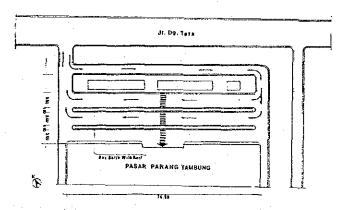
Parang Tambung Sub-Terminal Improvement Plan
